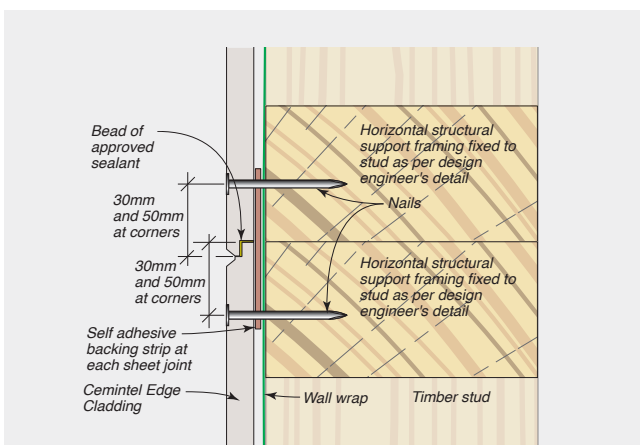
Typical Direct Fix Ribbon Cladding timber – Horizontal Joint
